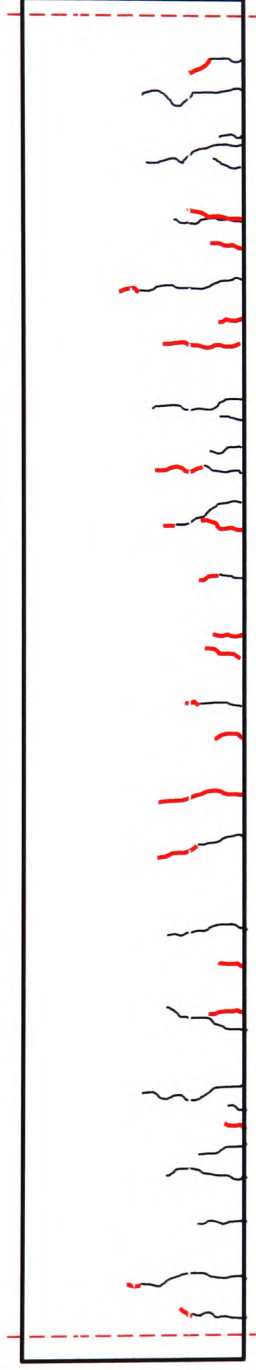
(b) – Schematic of crack pattern for 12CF3 within constant moment zone at failure
